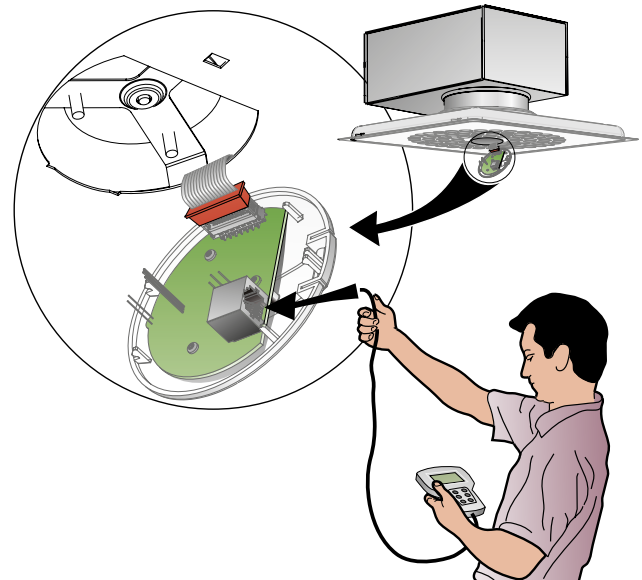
TUNE Adapt can be connected to an air diffuser by using the RJ12 contact on the circuit board.
